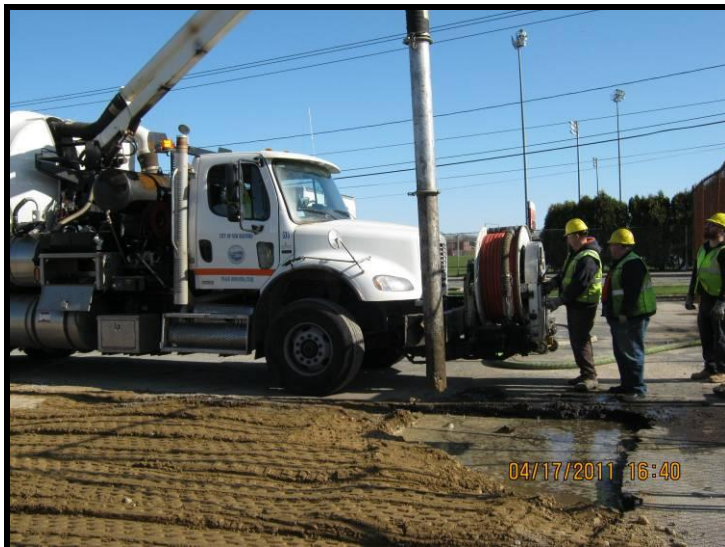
Vacuum excavation of SB-308 to complete backfilling activities (April 17, 2011).
